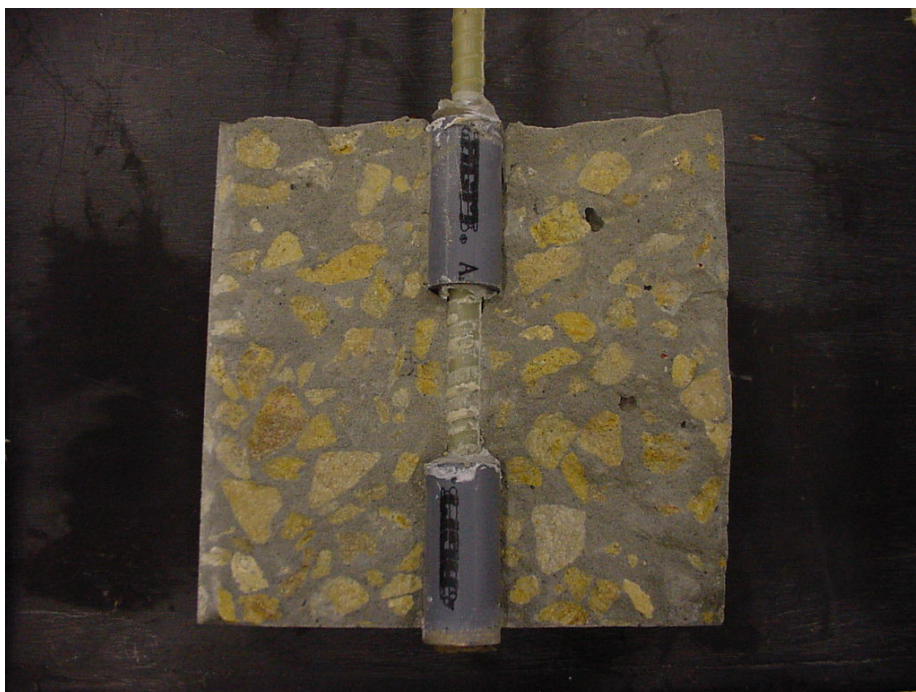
Interface between GFRP bar and concrete of bond failed specimen
